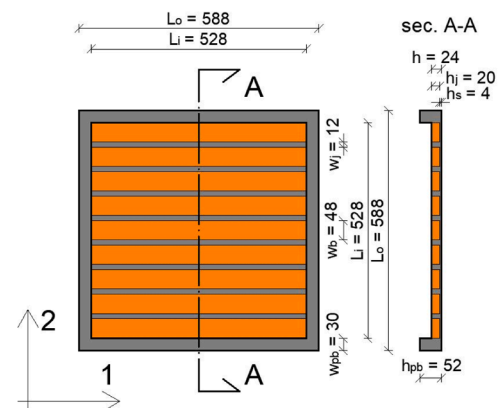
Plan view and cross section of the RC floor cell made with standard ceiling bricks (dimensions are in centimeters) considered as case study.
